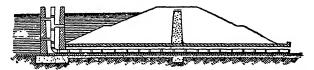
A Earthen Dam with core wall showing valve tower and outlet through dam
